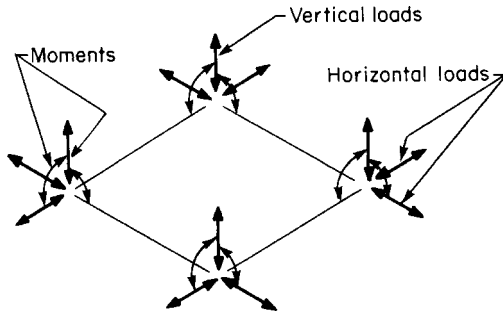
Typical loads acting on foundations for four-legged framed structures.
